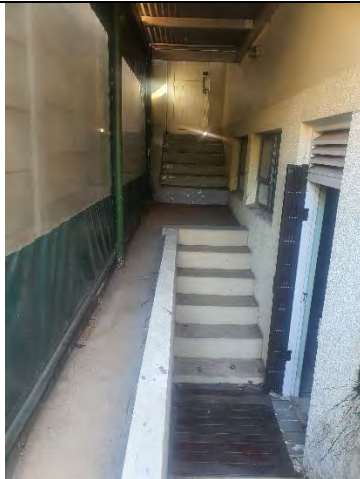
Stairs to basement/lower ground room & stairs to street level
